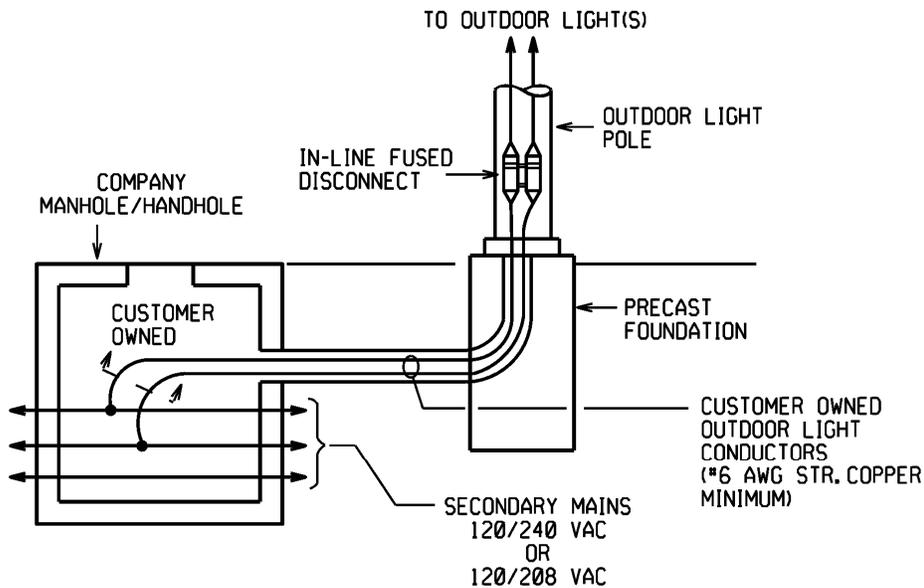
Connection of Underground Supplied Customer Owned Outdoor Light to National Grid Handhole or Manhole – Non-Standard Connection
